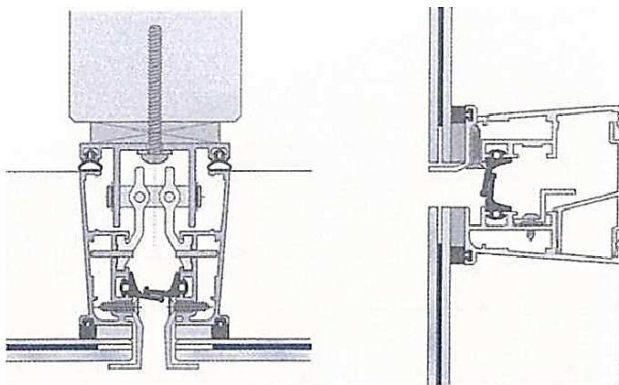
Detail of glass-glass PV module fixing with structural sealant glazing (Planning and installing, 2008).
